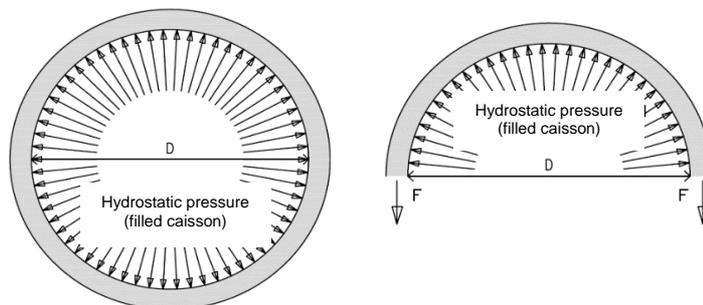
Load distribution principle of a cylindrical shaped caisson
